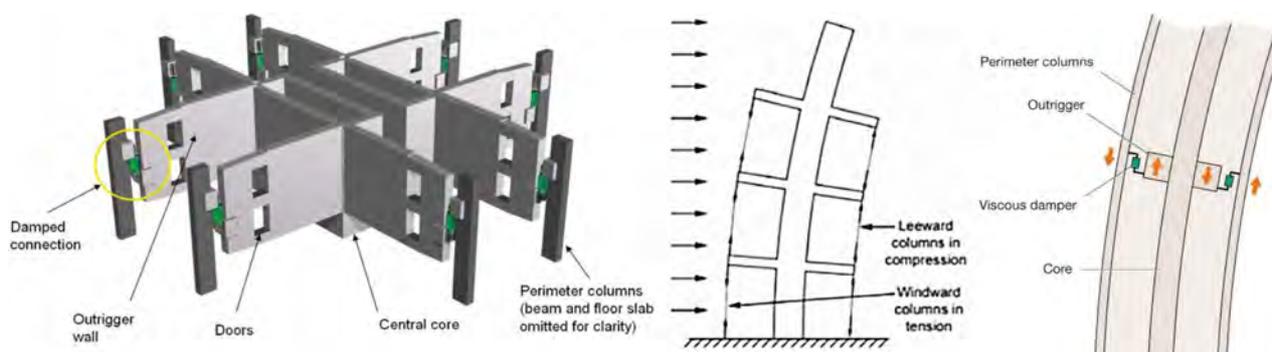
The outrigger concept for 60 Story Twin Towers in Manila (Smith and Willford, 2007).
